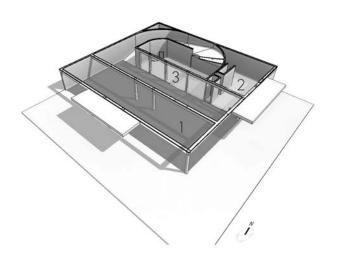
Building structure and existing spatial zones (ground floor)
